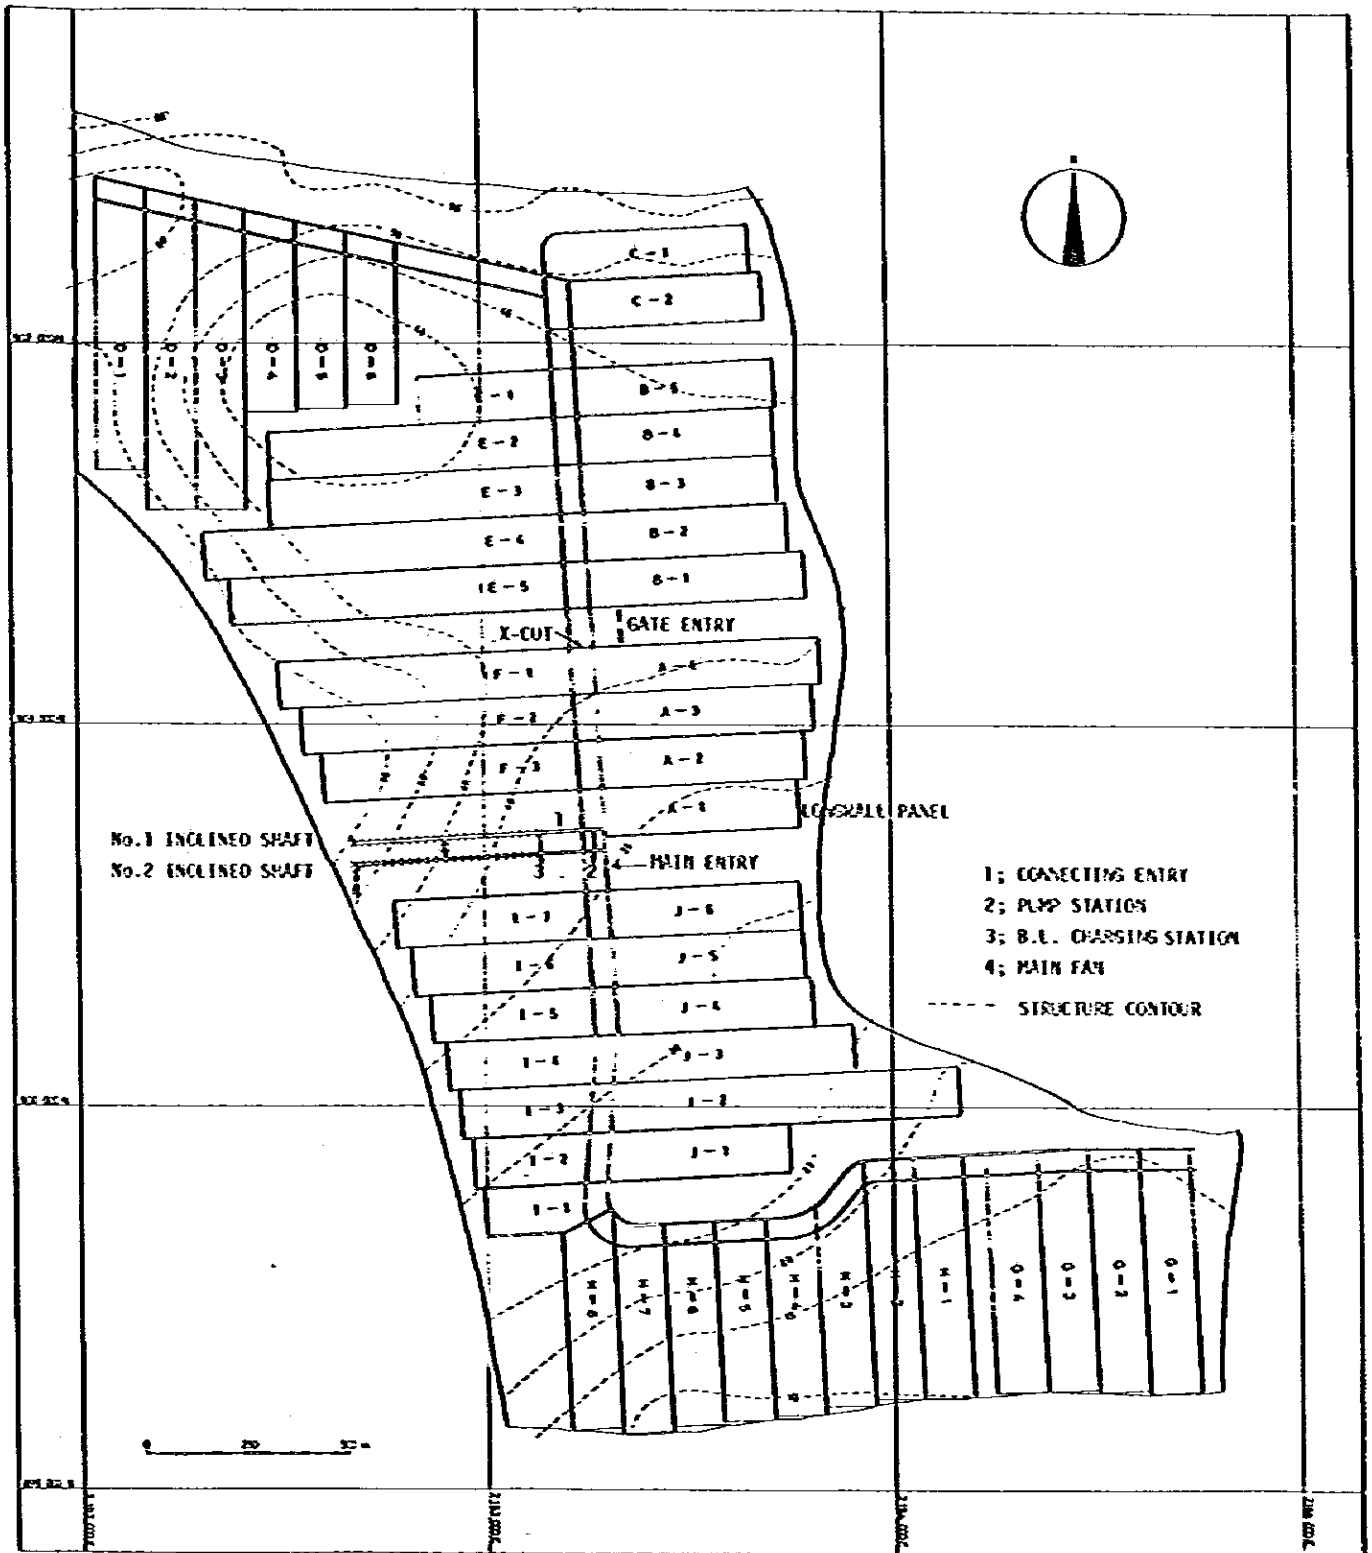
No. 1 SEAM MINING LAYOUT
